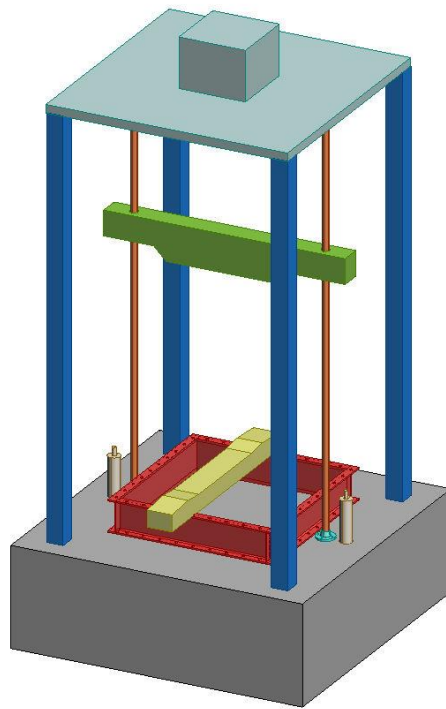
Extended finite element model of full-scale railway sleeper [4]
